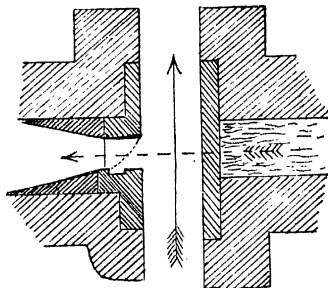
SPECIAL FORM OF AIR-CROSSING, IN PLAN.
